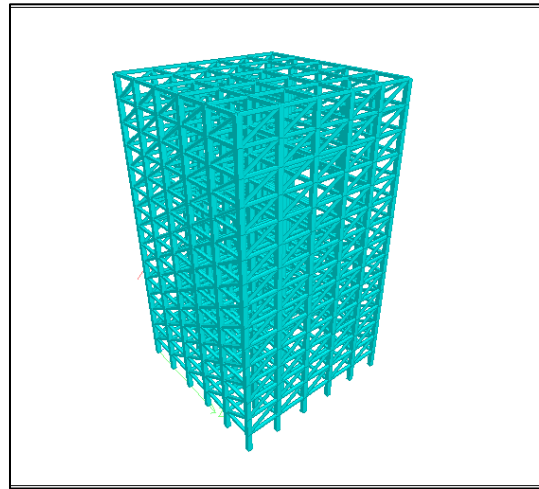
3-D View of Multi-Storeyed Building with Diagonal Concrete Bracings
